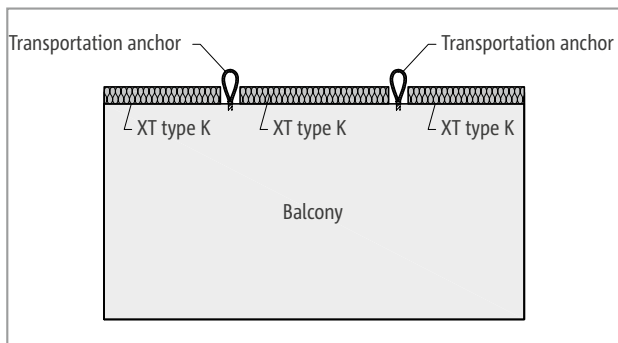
Schöck Isokorb® XT type K: Precast balcony with transport anchor; insulating adapter XT type Z can be inserted on-site
